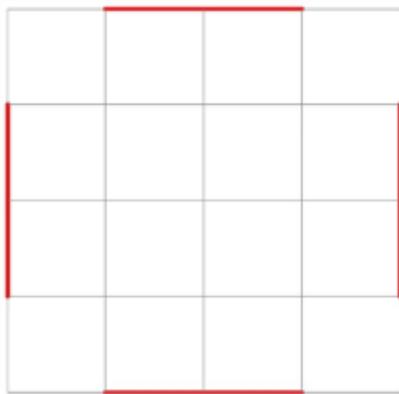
(a) Structural Plan for Inverted V-braced RC Frame (Model-4)
